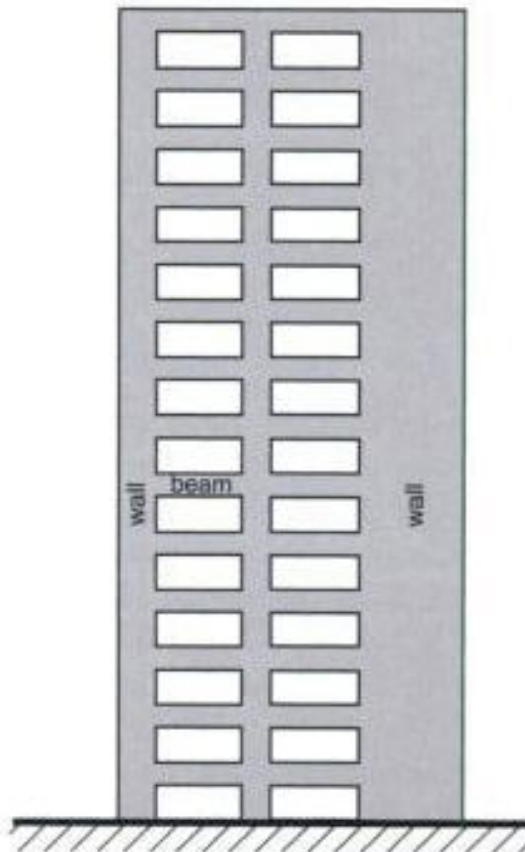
Bracing elements of a high-rise building – frames and shear walls
